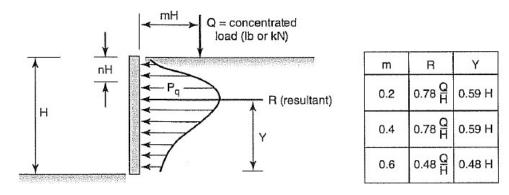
Pressure distribution against vertical wall resulting from point load, Q.
